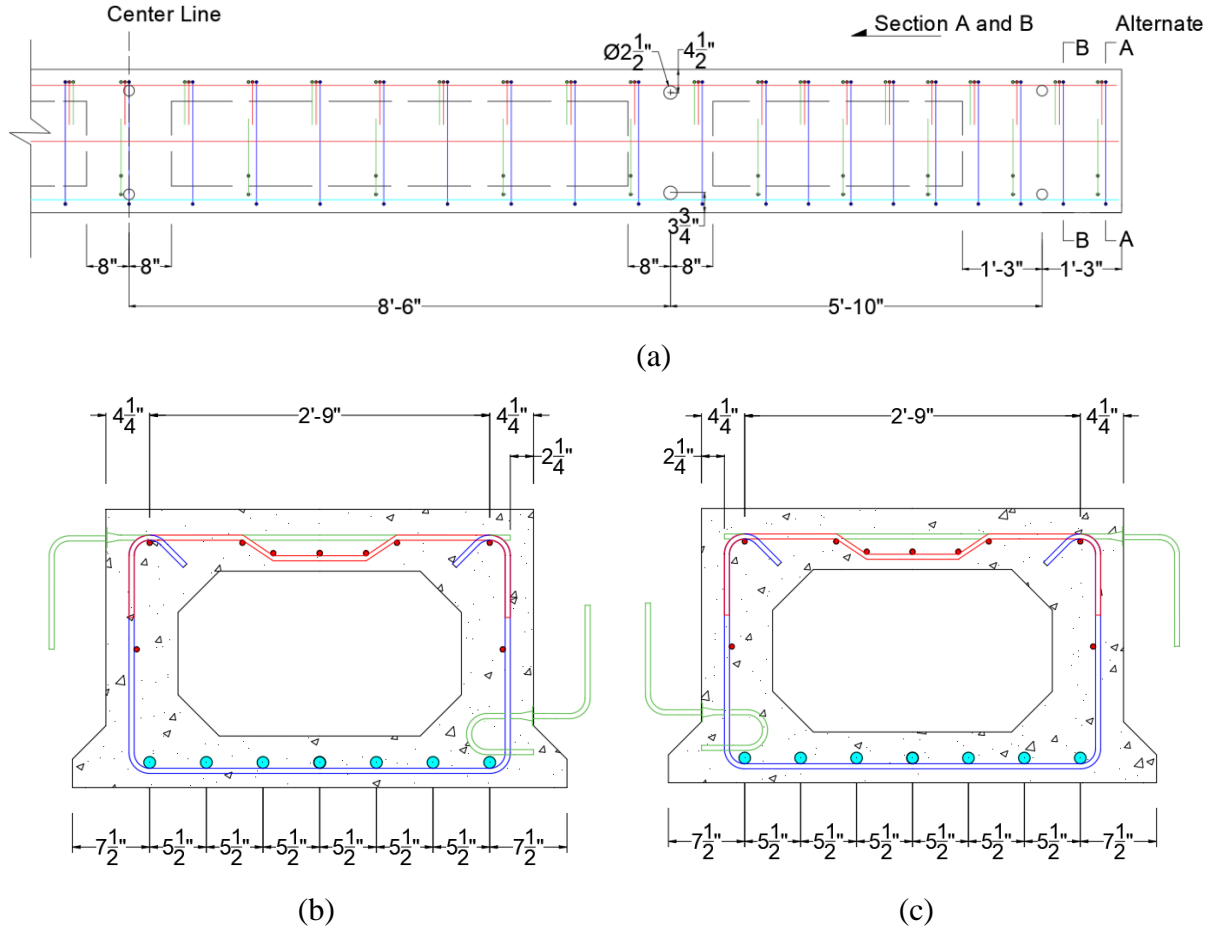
Details of joint details (1 in = 2.5 cm; 1 ft = 0.3 m): (a) elevation view; (b) A-A cross section view; and (c) B-B cross section view.
